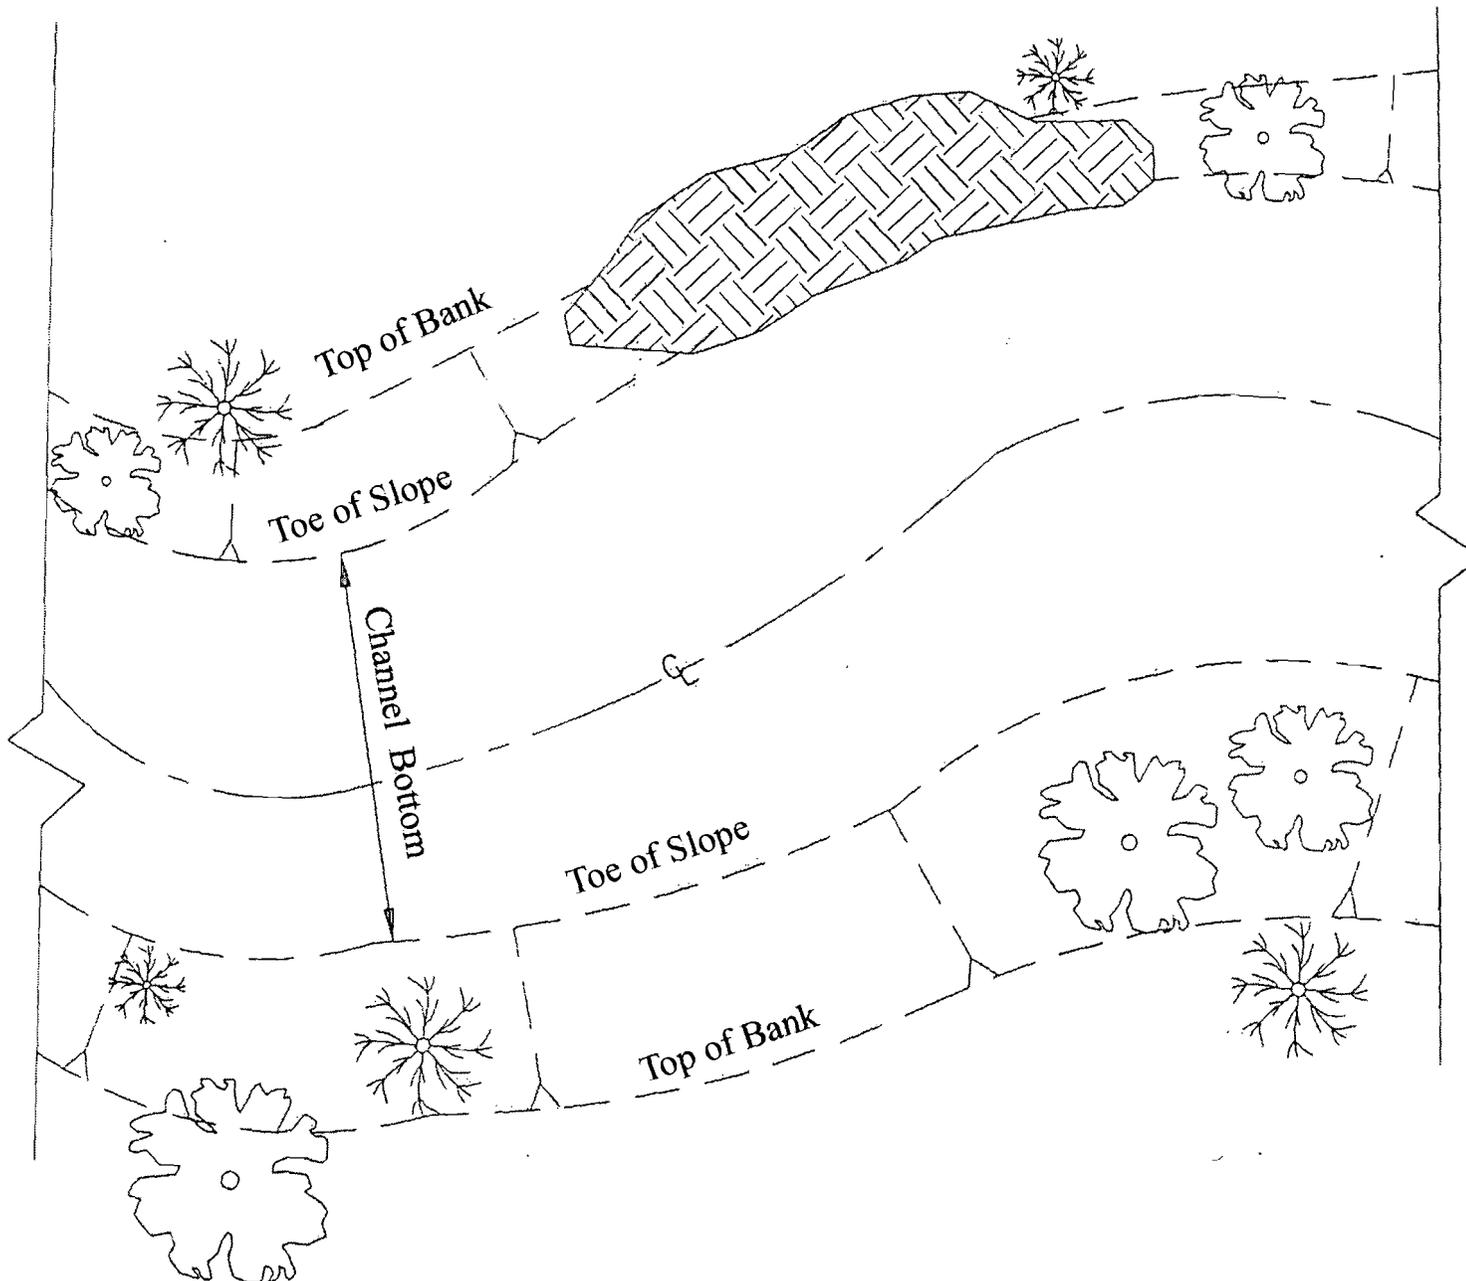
Terms Defining Channel Structure (Aerial view)
